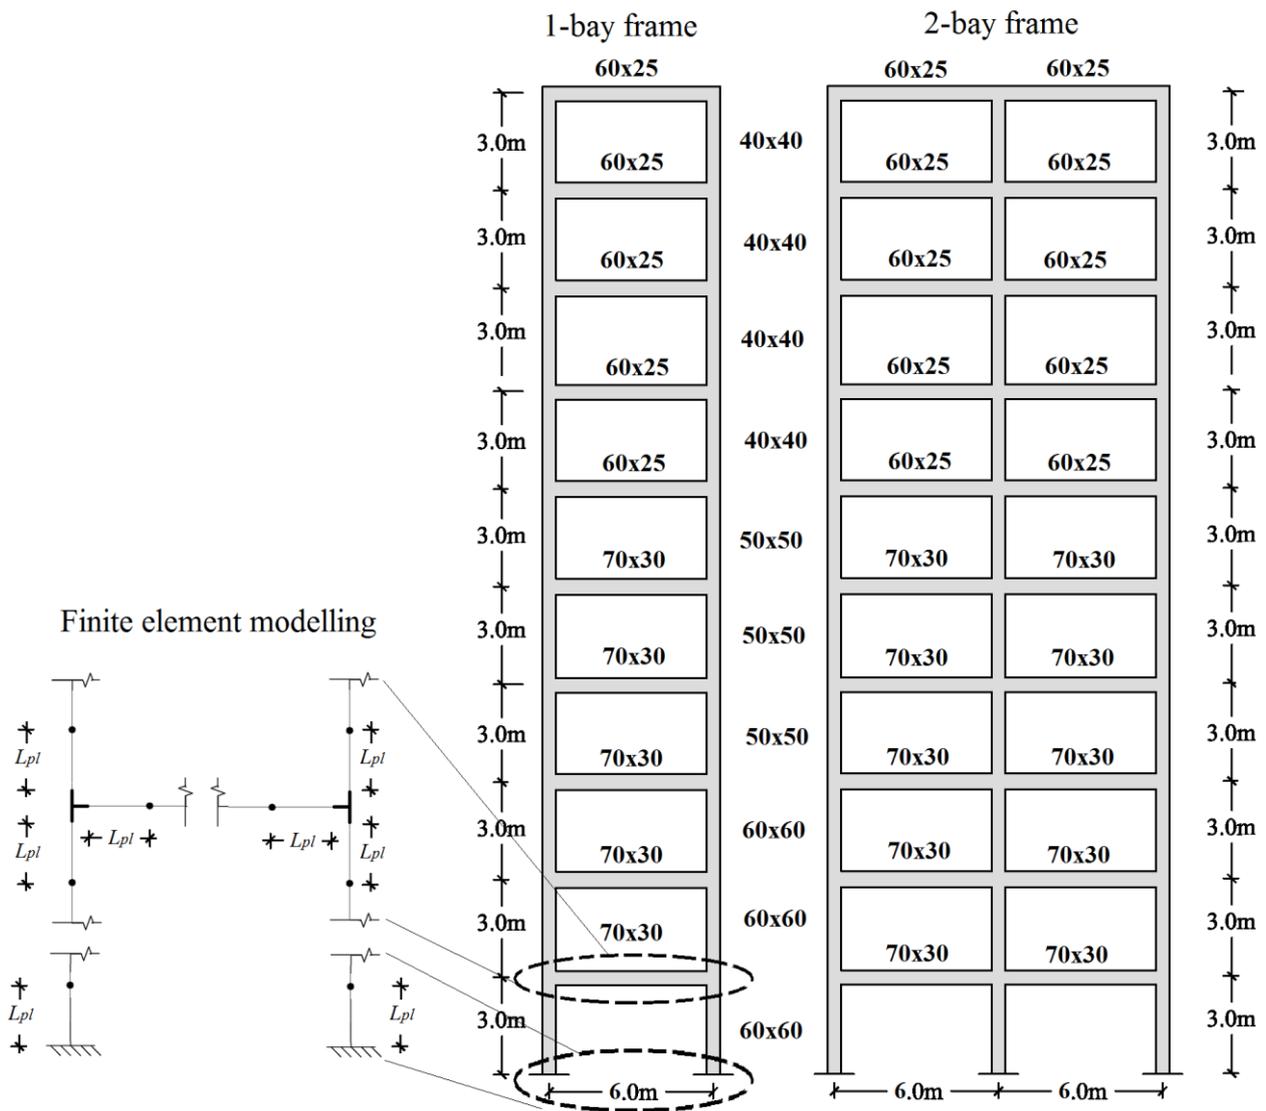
Considered planar r/c frame structures and finite element modelling of earthquake-induced damage
